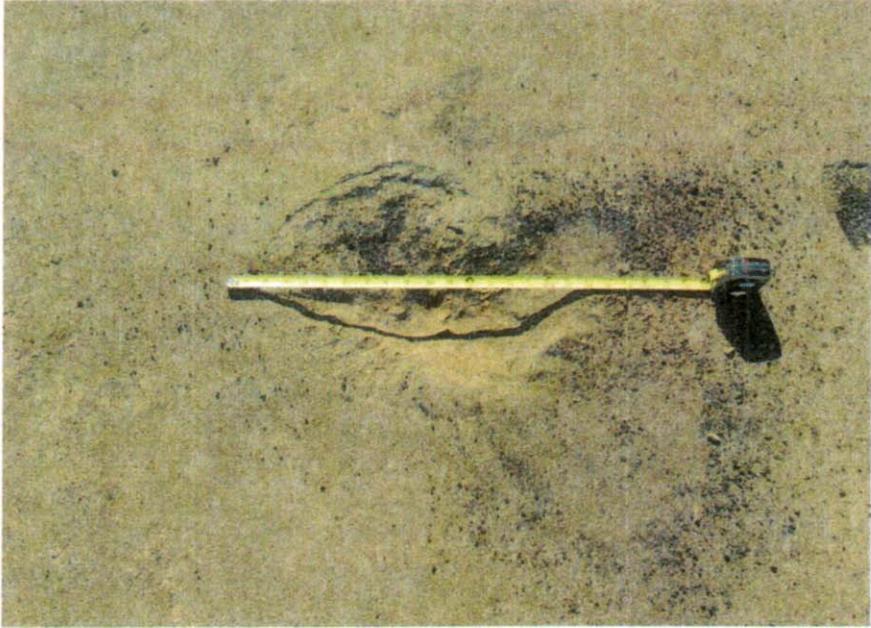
Clearwell Top Slab – Lightning Strike in East Quadrant of Roof
